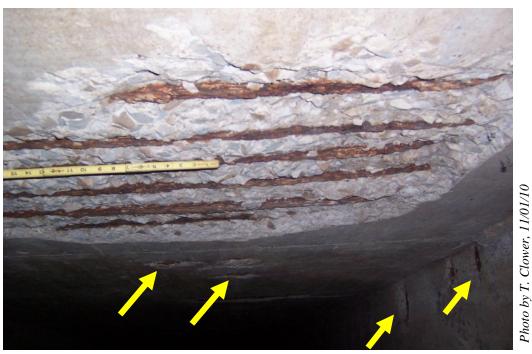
Facing South.* 75' north of the cemetery entry manhole. 3' diameter x 4" deep spall with exposed reinforcing steel in the top slab of the box culvert. Also showing typical spalls along the top slab and west wall.
